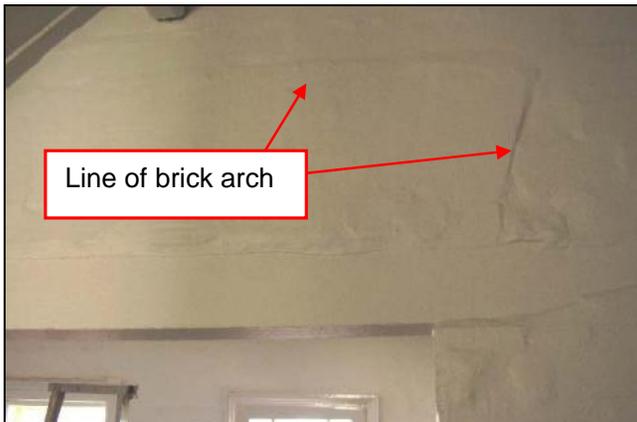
The brick arch of the original opening in the cross wall between the two rooms remains over the enlarged opening.
